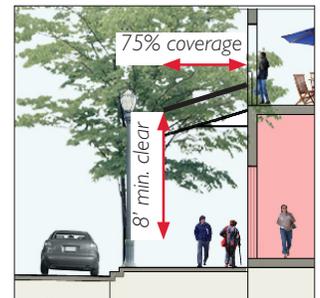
Awning section with minimum clear height above sidewalk & desired coverage.
